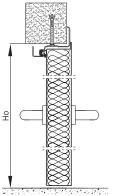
Installation of a single-leaf door with a corner frame to a masonry wall - vertical cross-section
